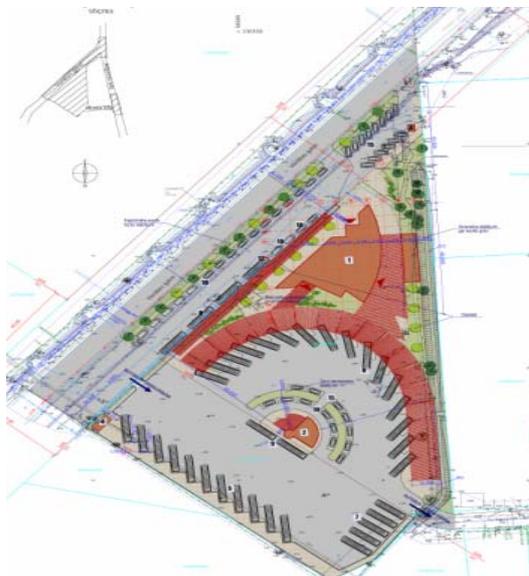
Plan of a new Riga Coach Terminal on Vienības Gatve Street in Pārdaugava
